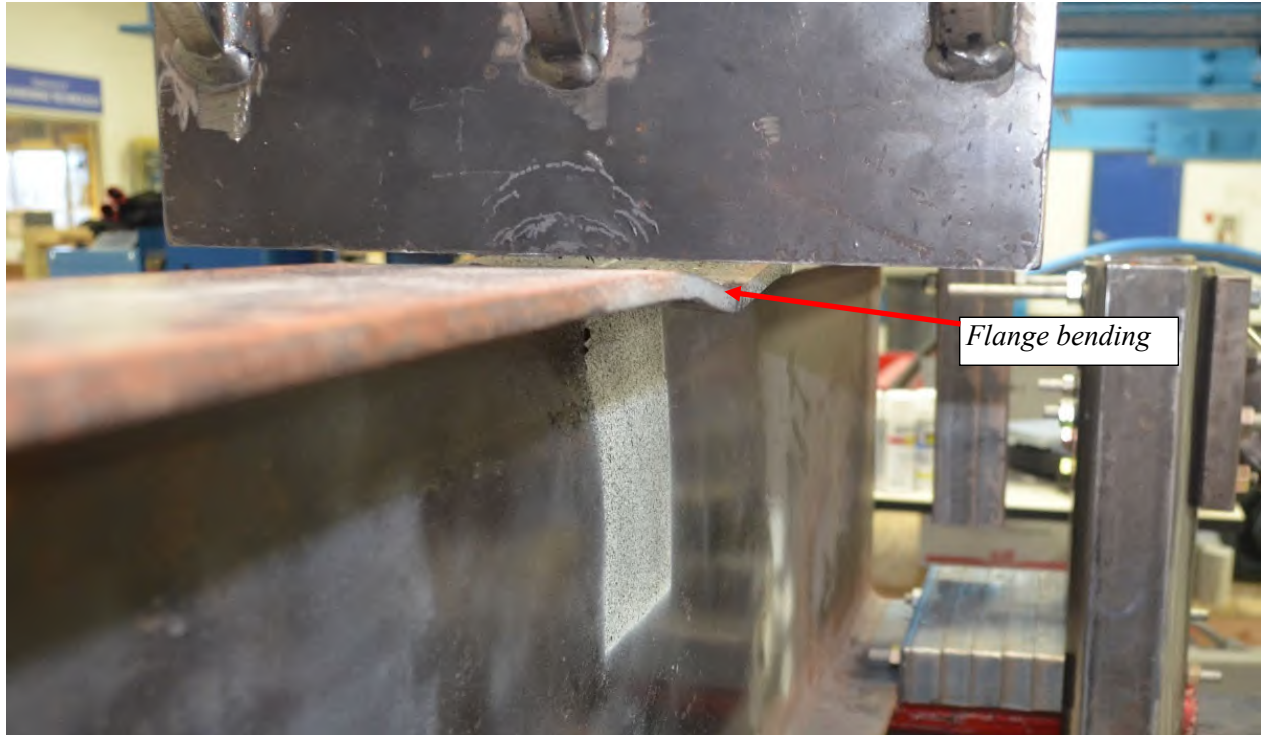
Bottom view of W12X26-SC-E0 after testing emphasizing yielding
